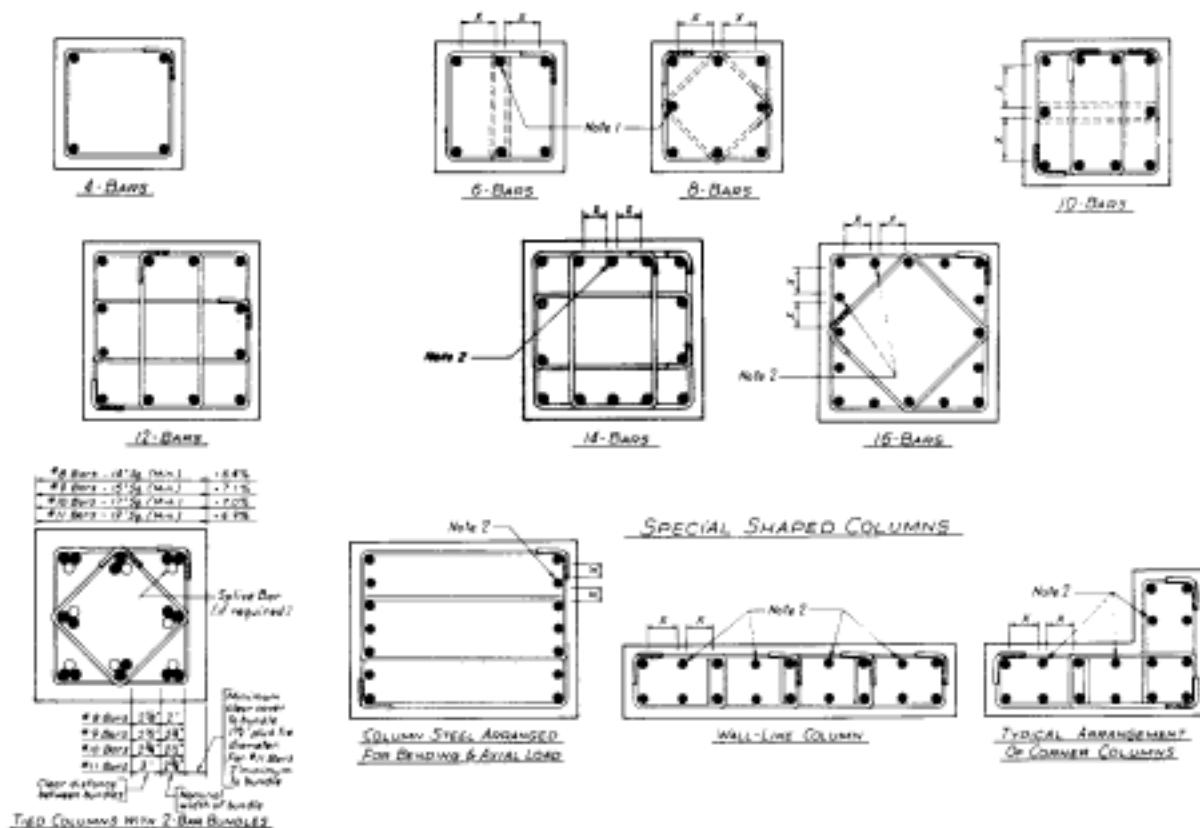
Column ties for preassembled lap-spliced cages (from Ref. 10.6).
